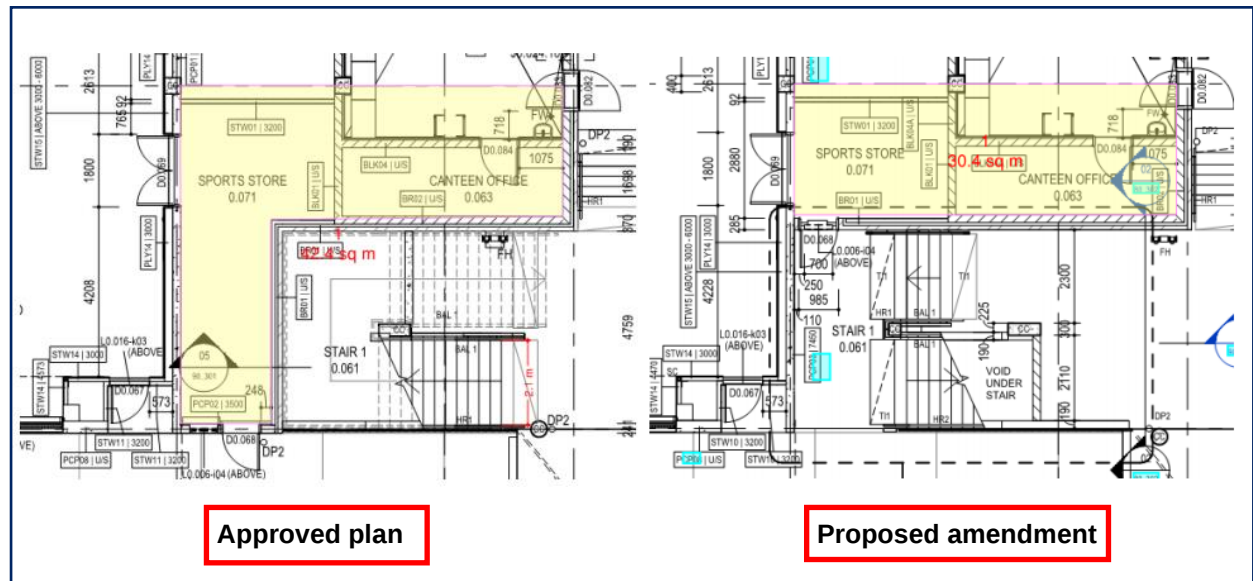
| snapshot of the approved and proposed reduction to the sports centre (Source: Applicant's modification application 2020)
